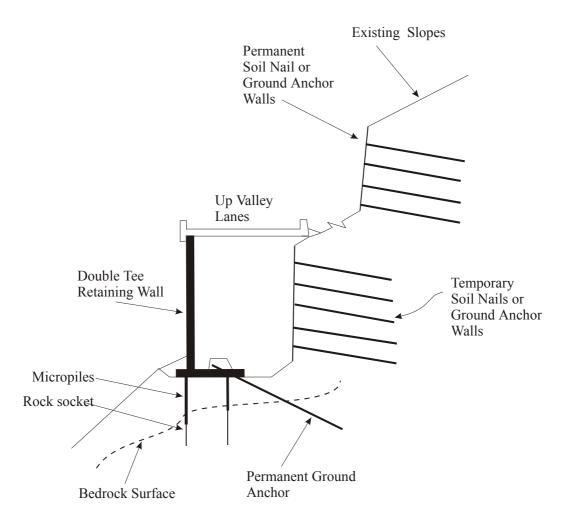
Generalized Profile of Retaining Wall with Micropile Foundation.
